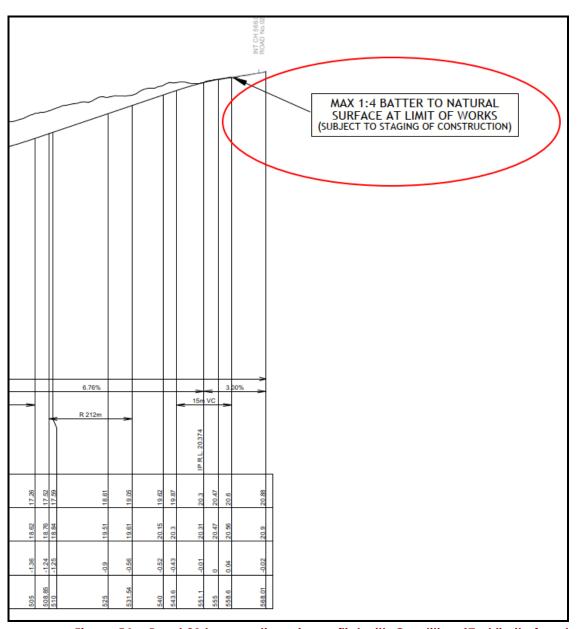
A – Road 01 long section – in conflict with Condition 47 at limit of works.
